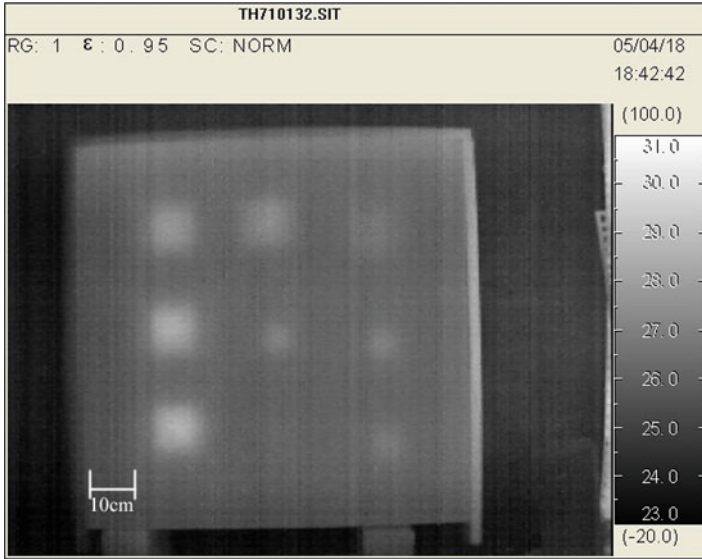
Thermal image of a concrete slab with embedded defects under the surface (after [3])
